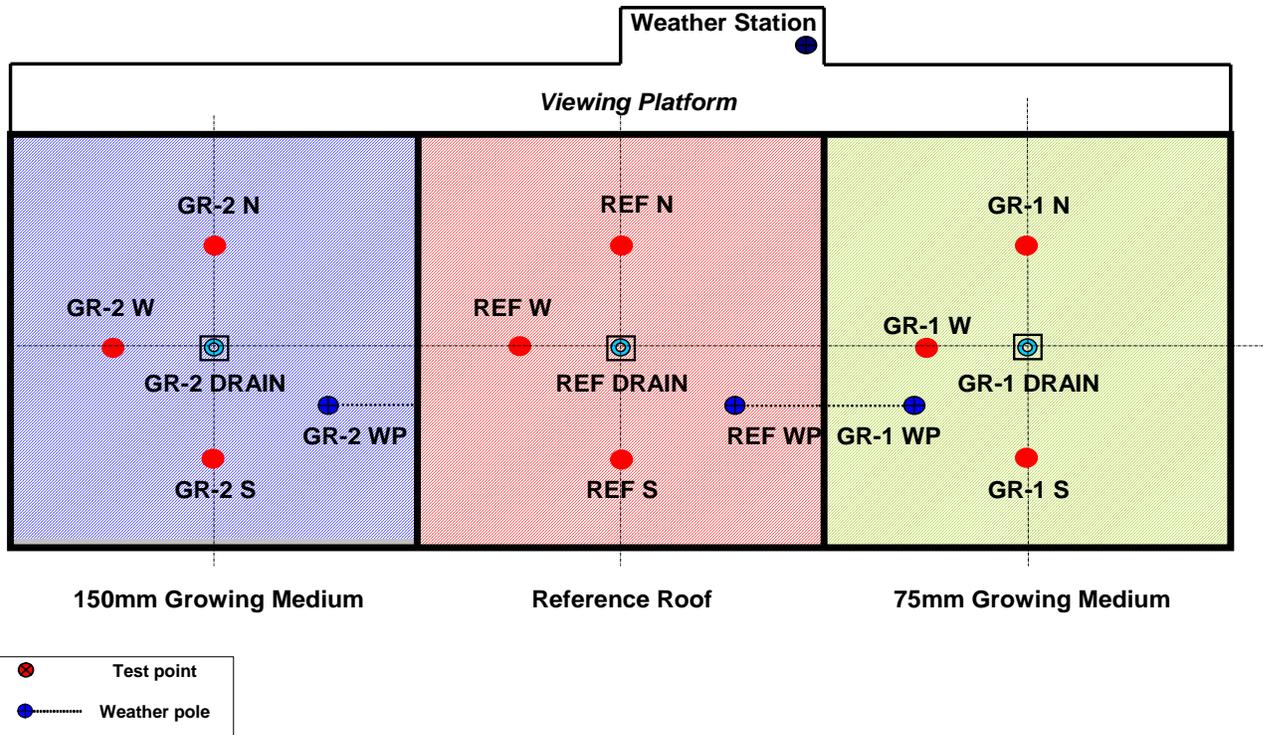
Schematic roof plan of the BCIT Green Roof Research Facility showing instrumentation locations and locations of weather poles and weather station.
